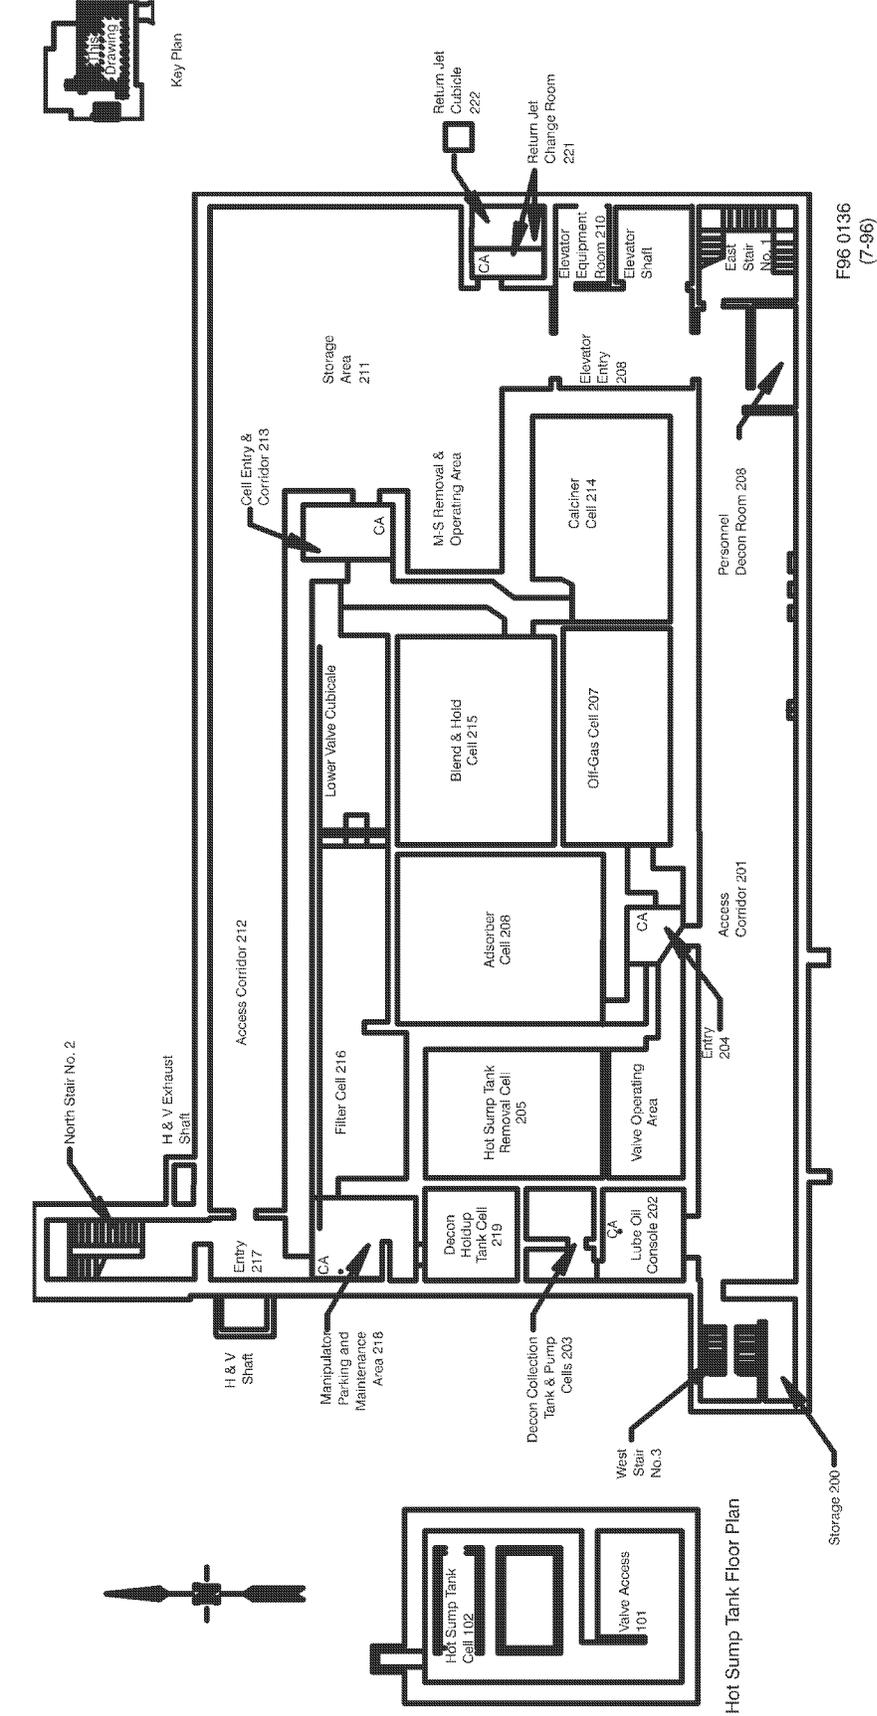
Third-level and hot sump tank cell floor plans, calciner area.
